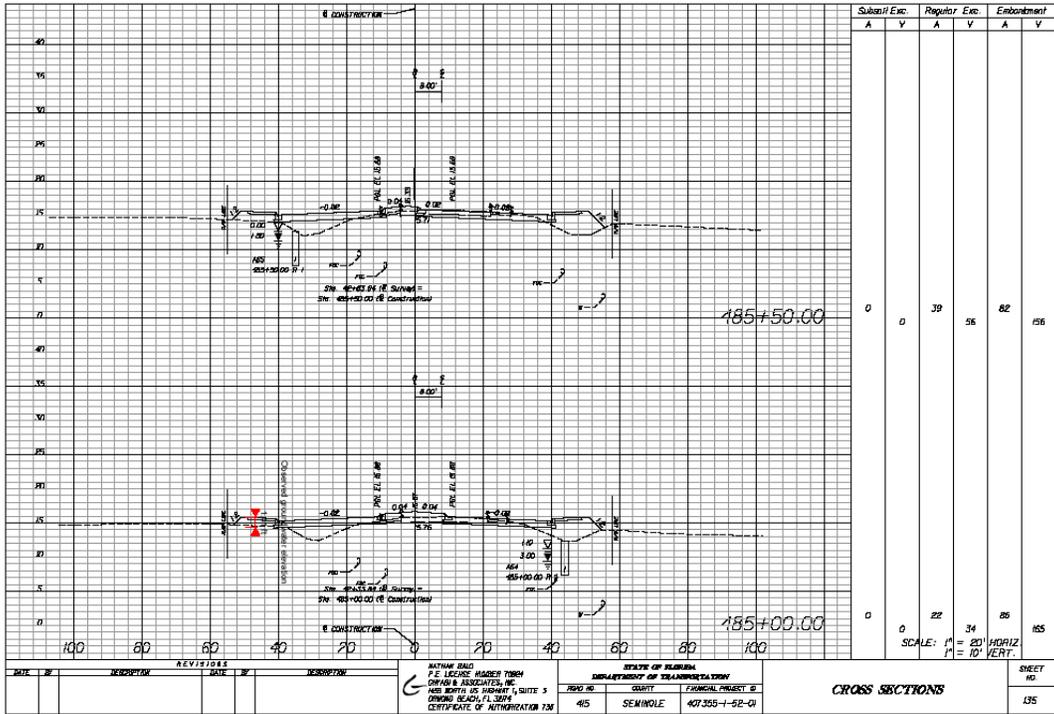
Station 485+00 cross section showing ground water measurement collected from sidewalk grade at a depth of 1.41 feet below grade.
